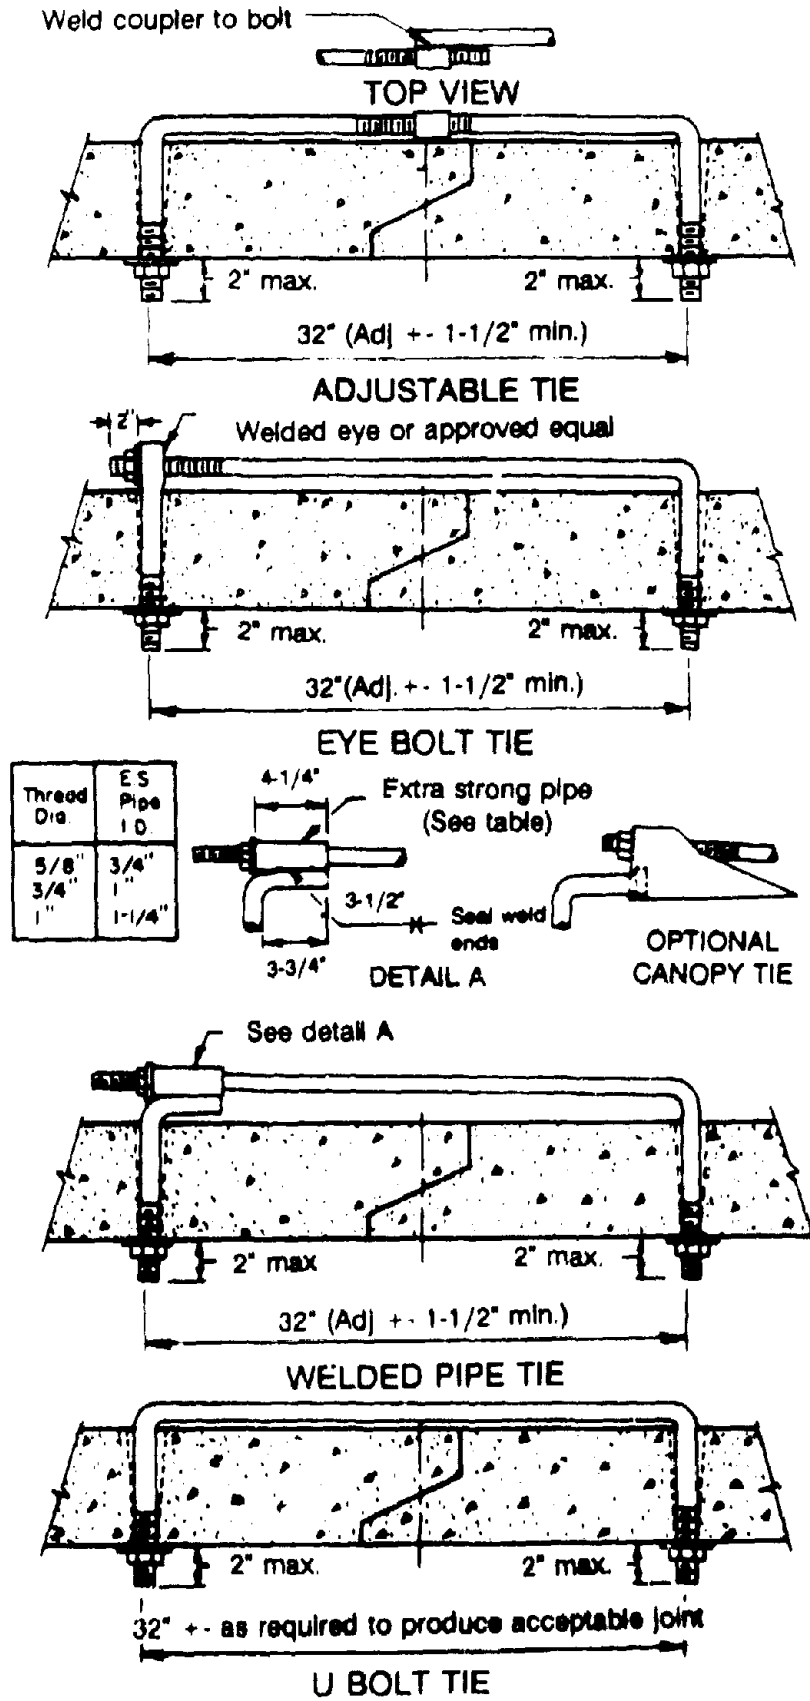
Concrete pipe ties. Source: North Dakota State Highway Department
